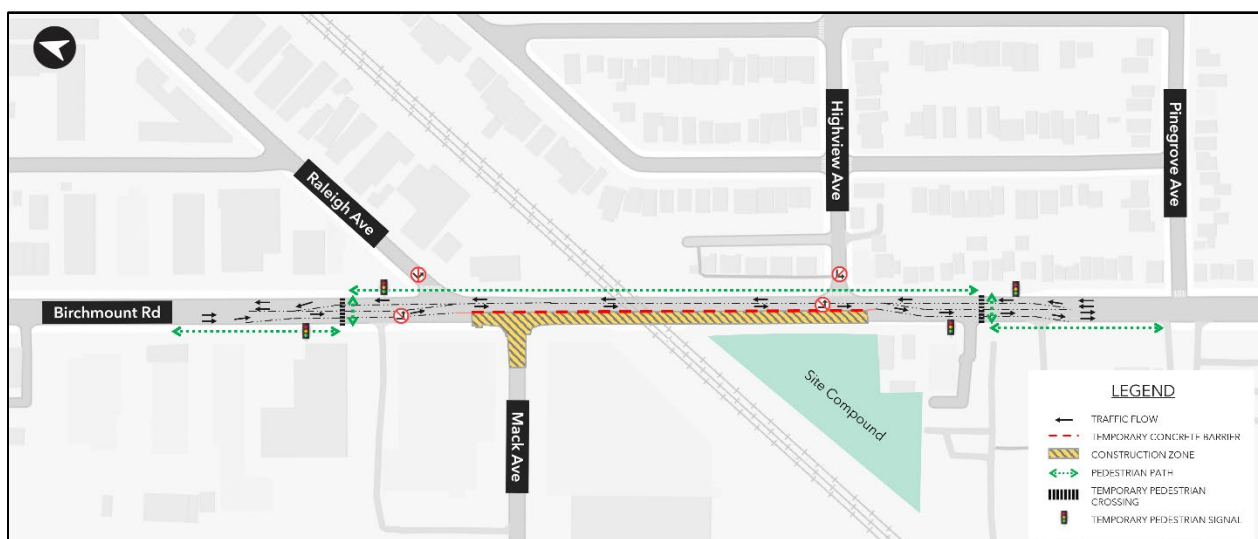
Birchmount Road Bridge – West Side Reconstruction
